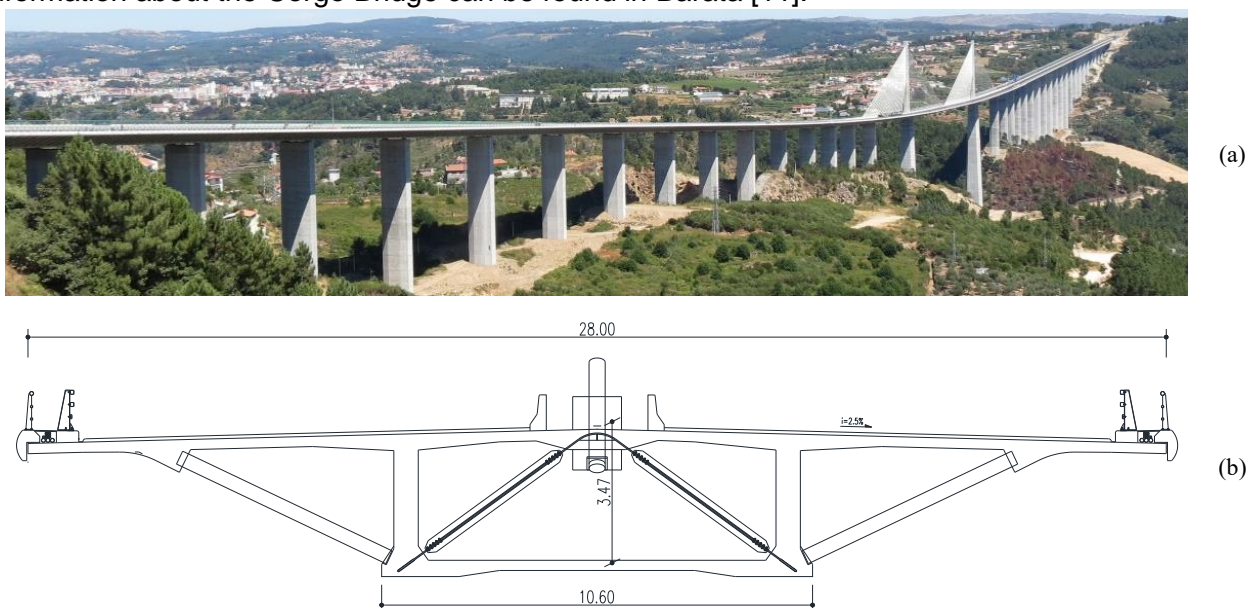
Corgo Bridge: (a) general view, (b) cross-section of the CSV.
